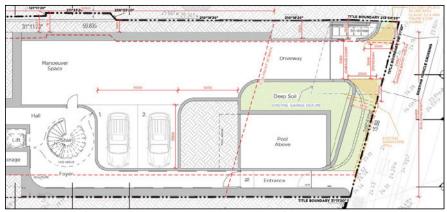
Example of a vehicle turning area in the basement level of a dwelling house
